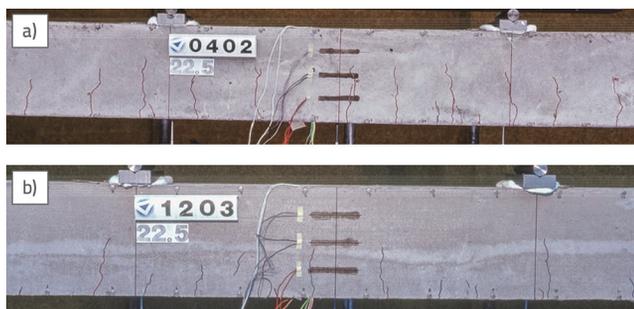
Cracks to a force of 22.5kN: a) RB-PC beams; b) RB-SF beams
